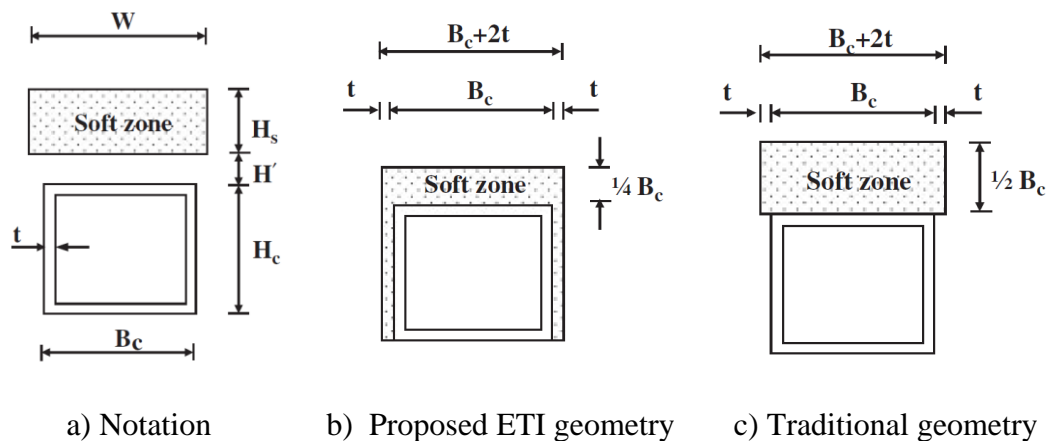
Trench applications (Kang, Parker, Kang, et al., 2008)
